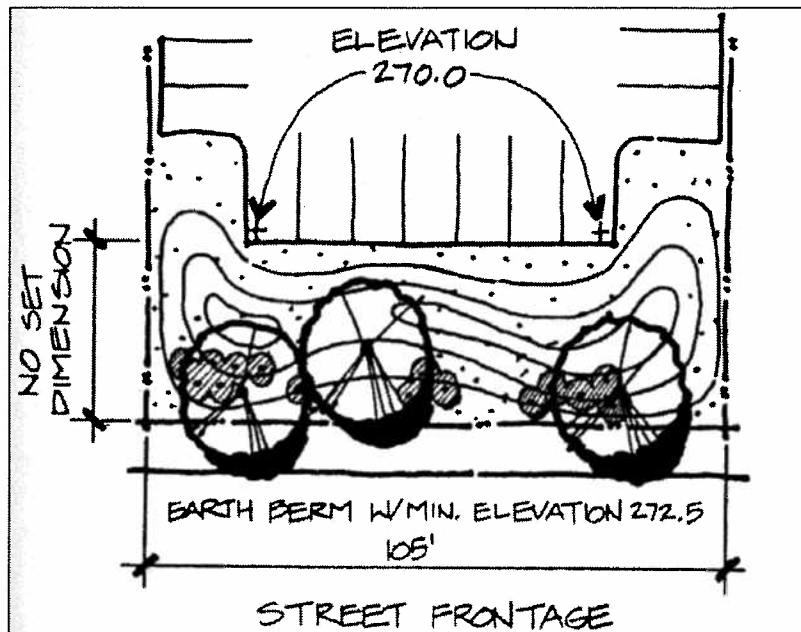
Parking Lot Landscaped Strip, Option 2
